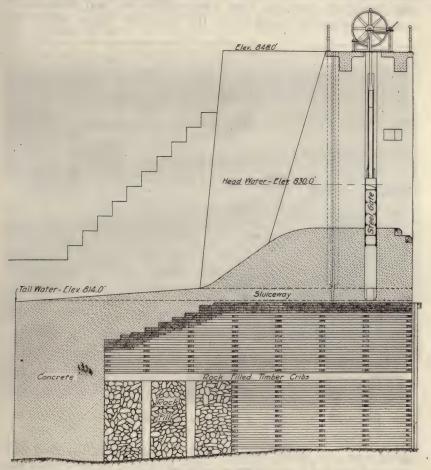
Dam at Kilbourn, Wis., With Movable Crest, Southern Wisconsin Power Co. (see page 648).
